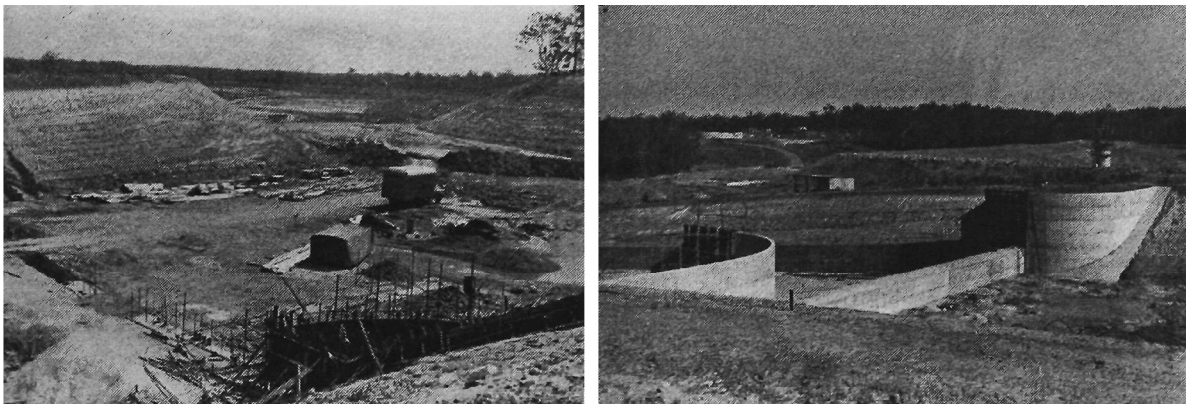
Leslie Harrison Dam under construction, 1967 (*John Stokes*)
